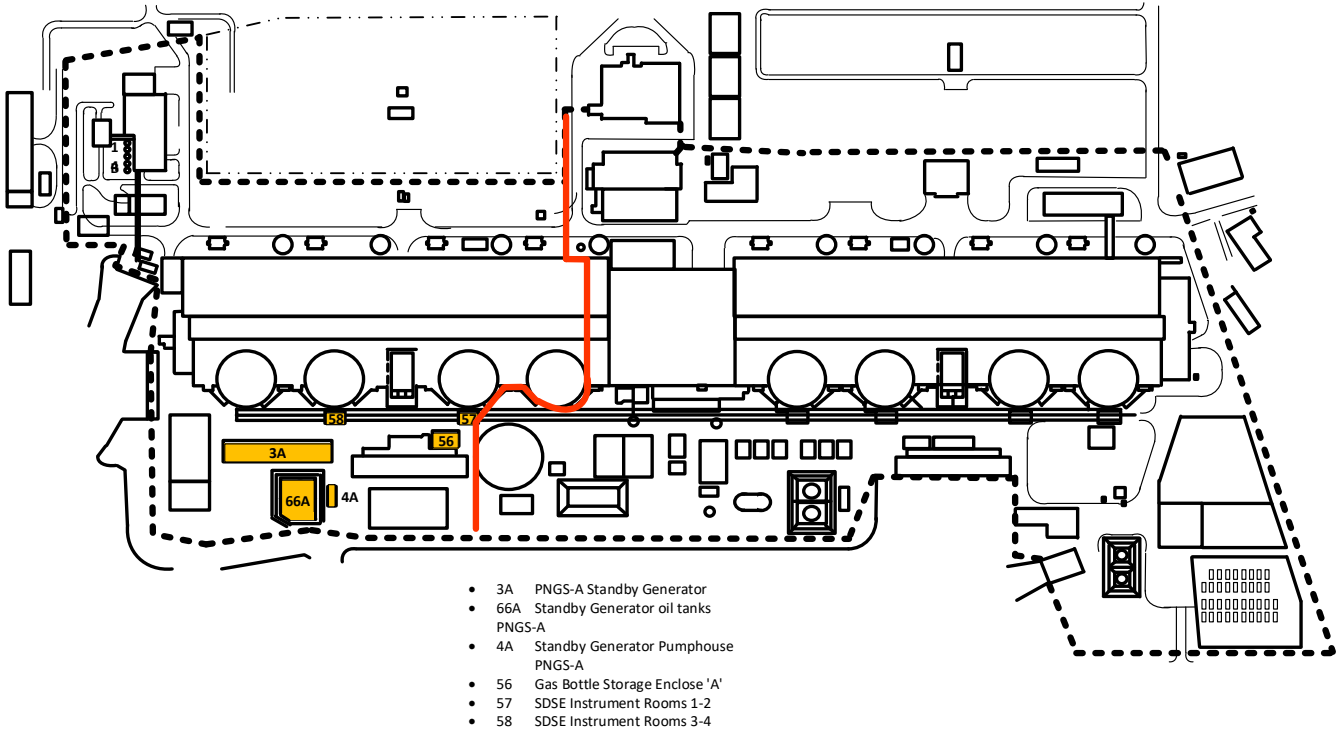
Planning Envelope A - Group A-2 Out Buildings Highlighted in Orange
